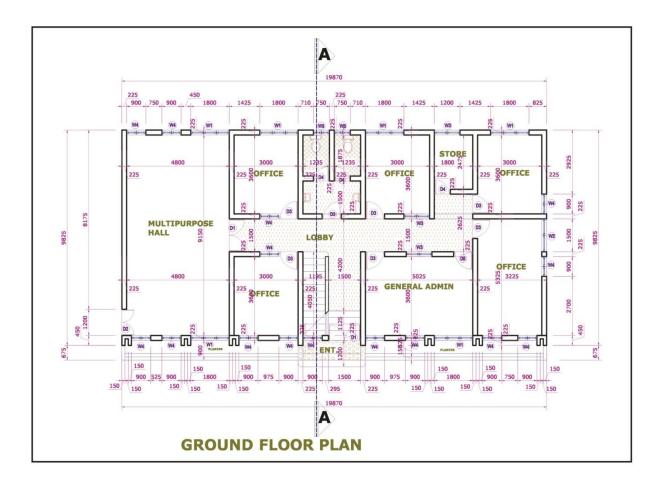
Prototype Botanical Garden Structure Office Building Ground Floor Plans.
